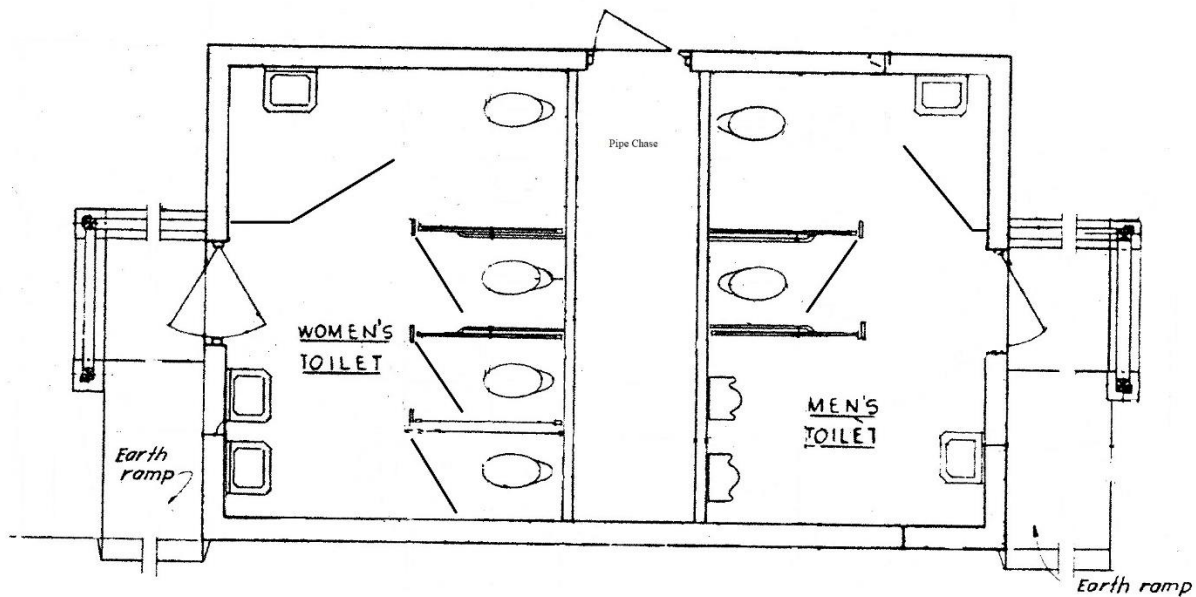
Approximate floor layout of the Elm Brook Park lower restroom building. The water tank and pipes (not shown in diagram) are located in the pipe chase against the wall opposite the door.
